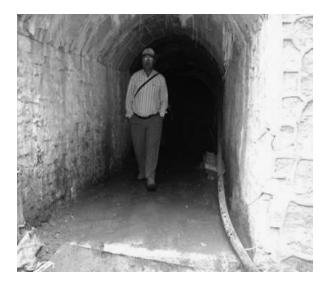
An under-construction headrace tunnel in a 3.0 MW Chaku hydropower plant, Nepal.
